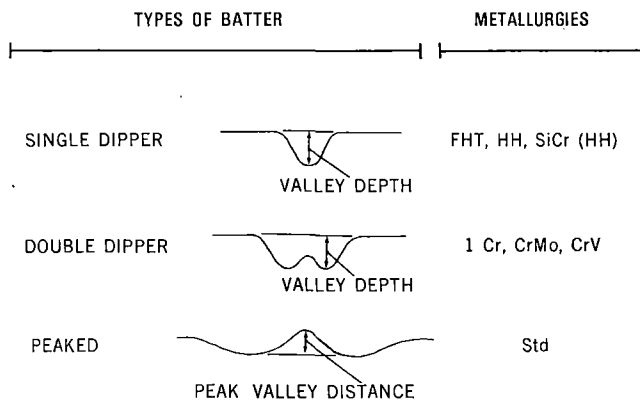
CATEGORIES OF WELD BEHAVIOR.
